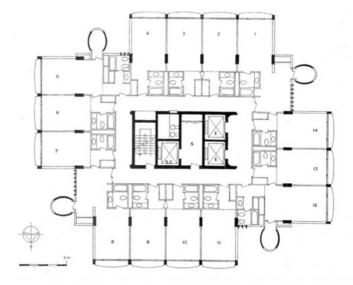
Drawing of a floor plan tower (source: Nationaal Archief van Curaçao)
